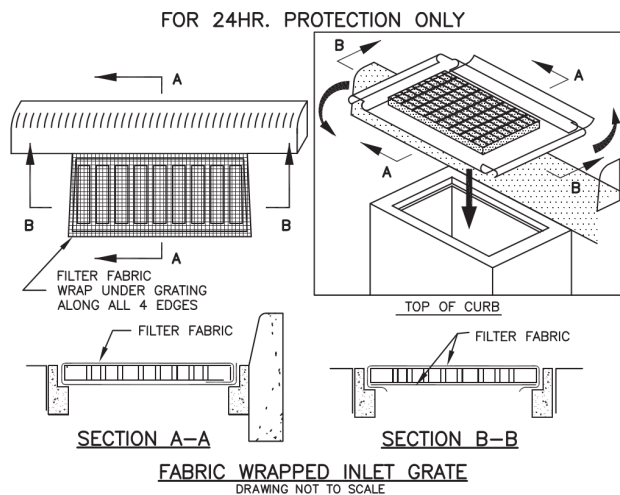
Plan, section, and pictorial views of a fabric wrapped inlet grate erosion protection method.
